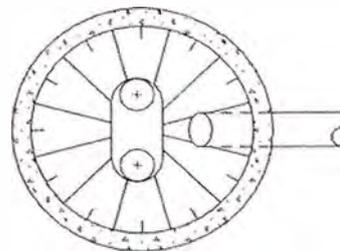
Circular wet pit with sloping walls and minimized horizontal floor area (submersible pumps shown for illustration)
